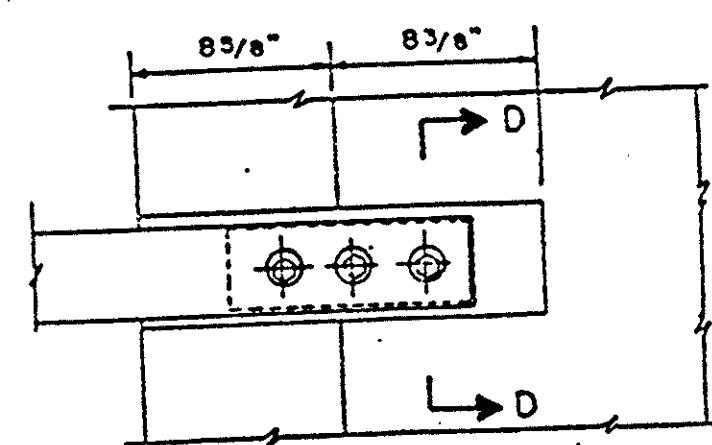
DETAIL OF CONNECTIONS FOR SPECIAL END SHOE
